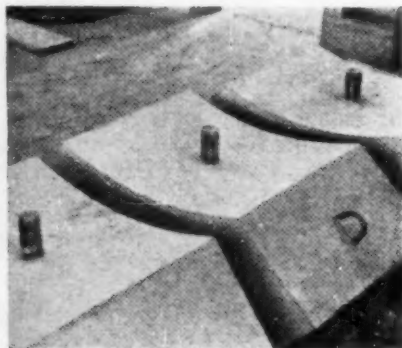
Precast Blocks for Hinges of Columns between Bays.
